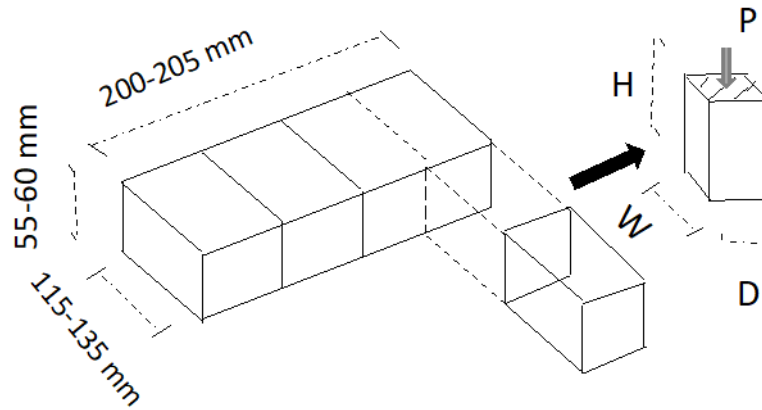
Dimensions of bricks and loading arrangement of unit brick compression experiment
